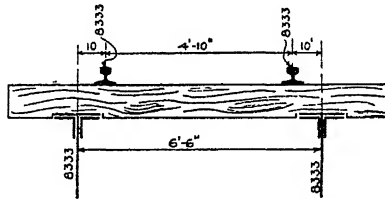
Distribution of Loading on Ties of Deck Plate-Girder Bridge
